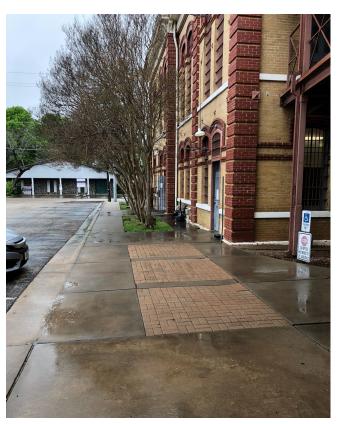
Perimeter of building will receive 2' wide concrete mow strip.
